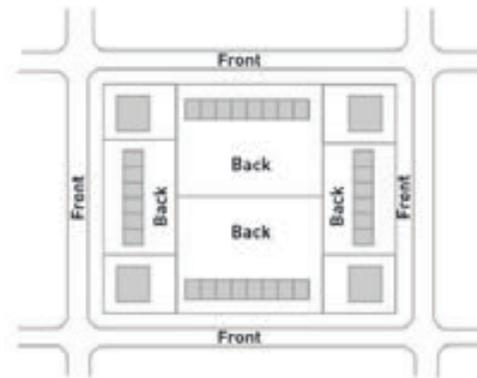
Perimeter block layout ensuring a clear definition of front and back and a strong building line to the street
